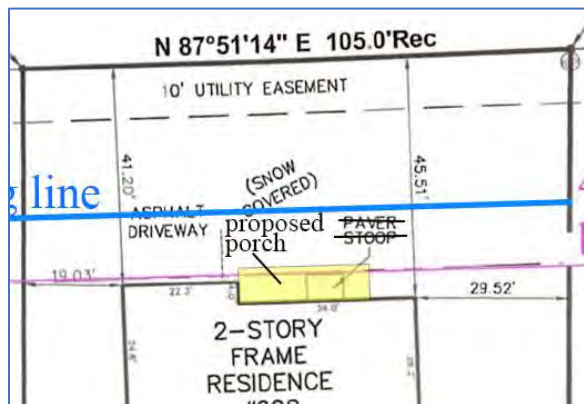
Proposed covered porch shown past the 40-foot front yard setback
